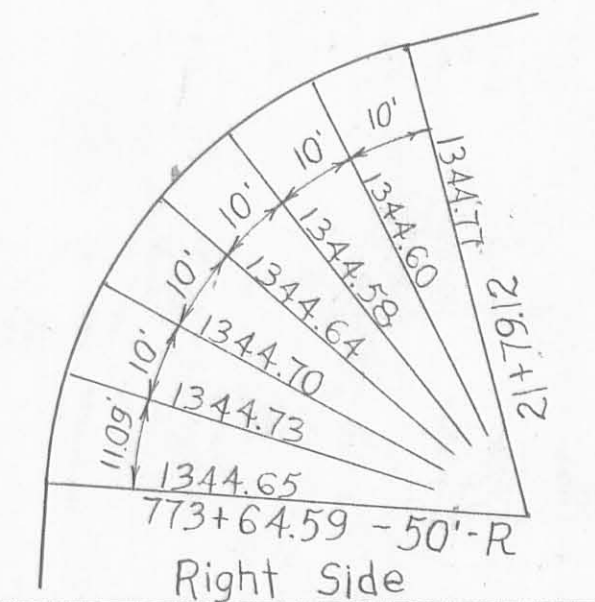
DETAIL SHOWING SIDEWALK APPROACHES TO DRIVES
